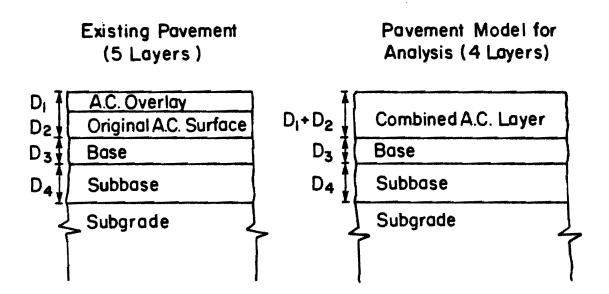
Idealized pavement model for a flexible pavement overlaid with one or more AC layers.
